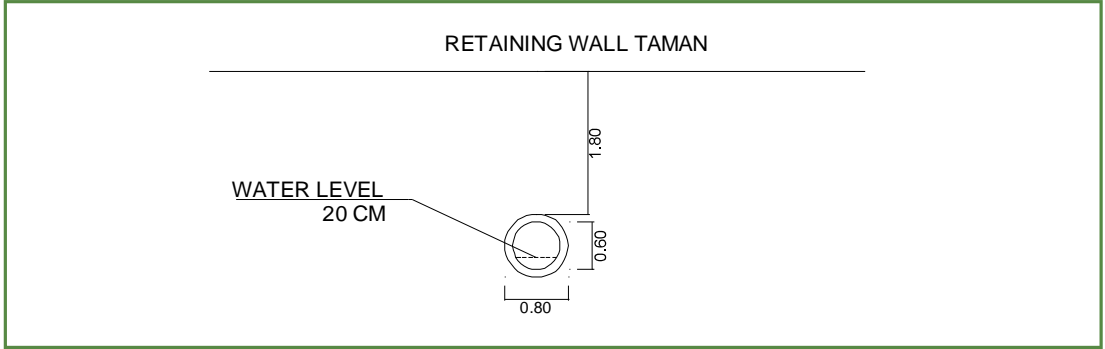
DETAIL OF CULVERT-2 (TAMBORA AREA-1)
